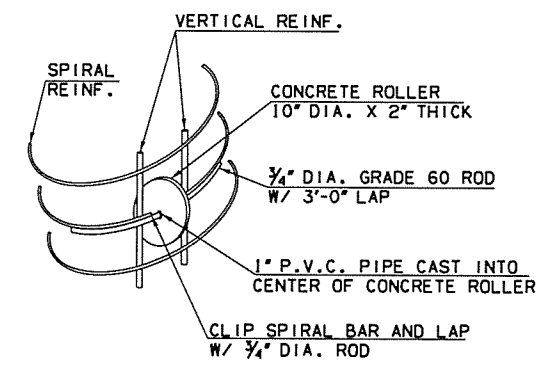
DETAIL OF DRILLED SHAFT ROLLER PLACEMENT
